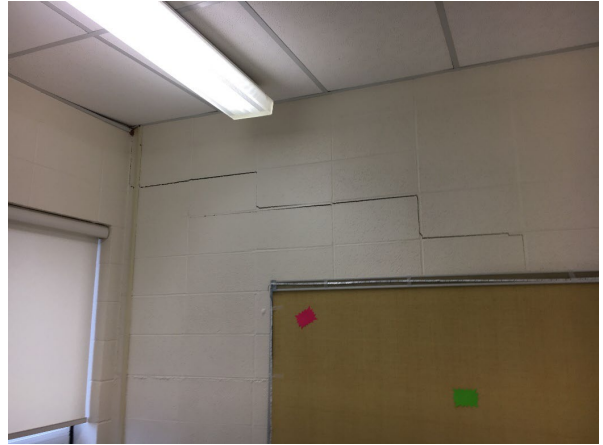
Zigzag cracking in wall between classrooms 111 and 112
